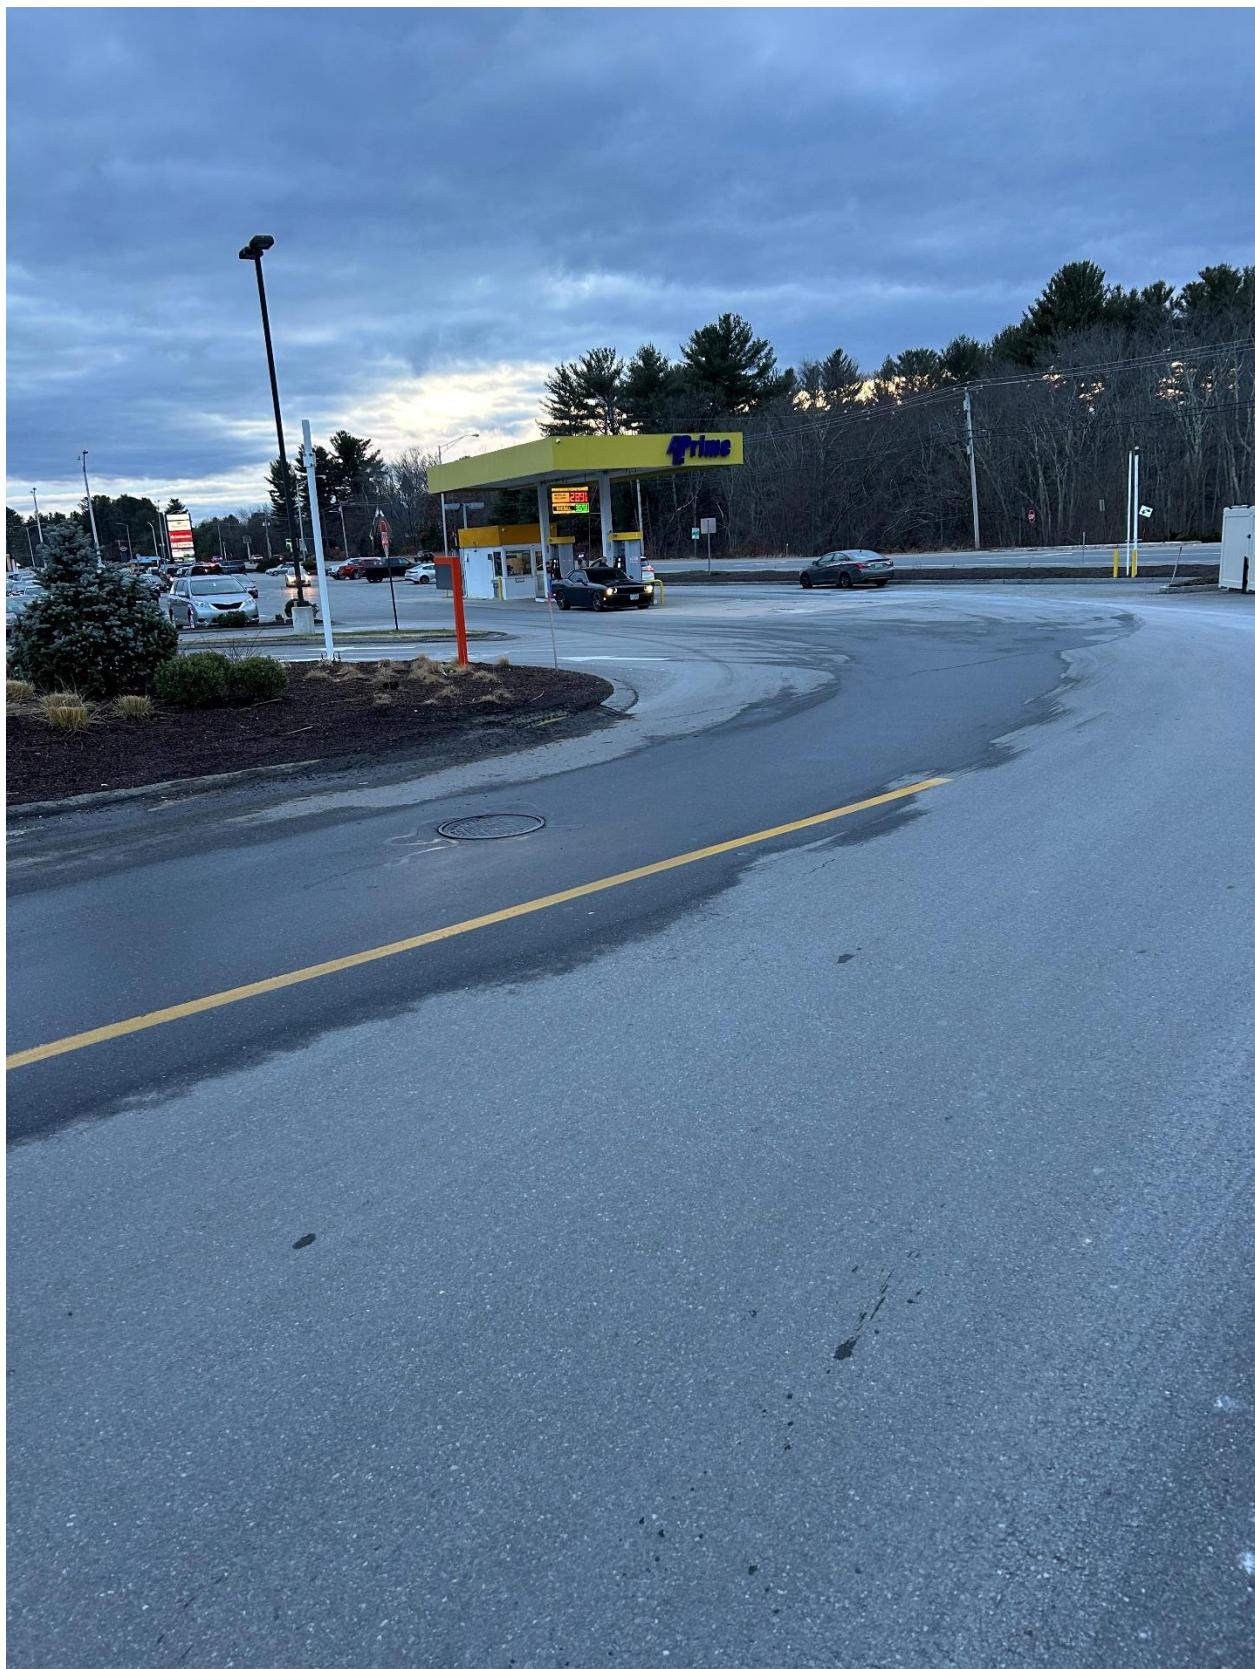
View of Prime gas station, illustrating the overflowing manhole.
